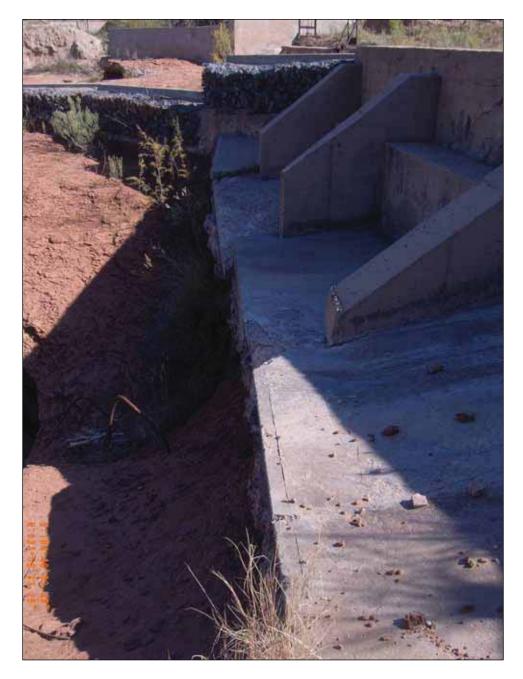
View of wall at north end of spillway, with gabion in background.
